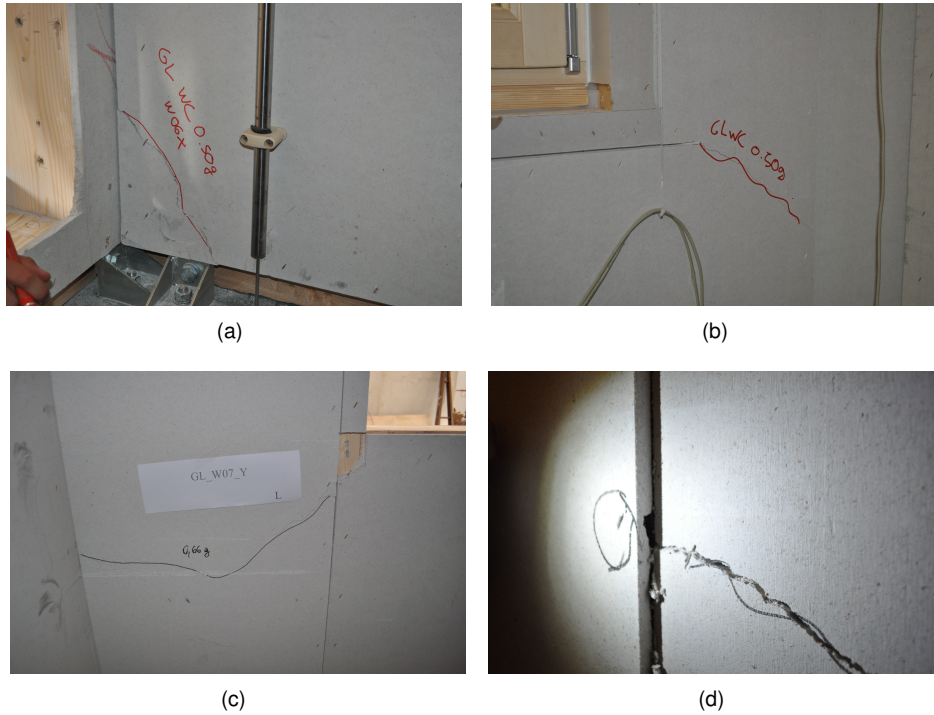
Cracking of GFB in the proximity of the hold down anchor on wall W06_X (a) after test D19 (a), cracking on gypsum wallboards at corners of openings at the ground level on wall W02_Y after test D19 (b), cracking on the GFB on W07_Y after test T9 (c), Spalling at the corner of the window on wall W06_Y, north after test T9.
